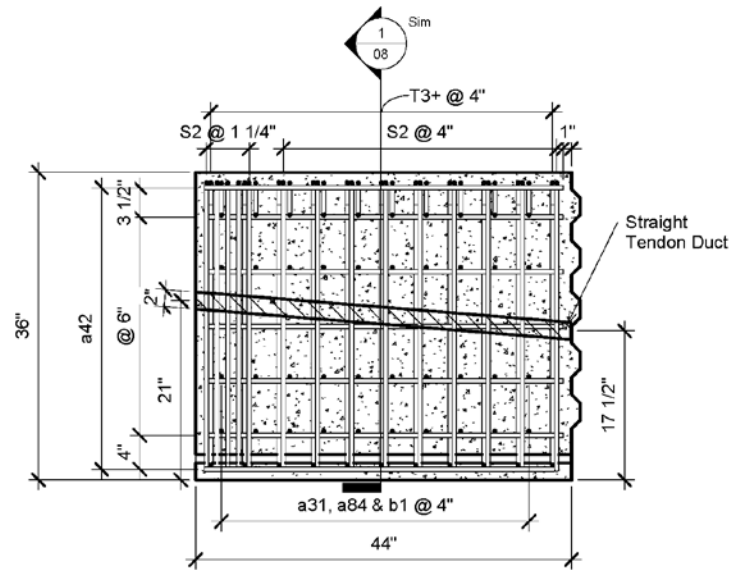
UNB2 Typical Longitudinal and Transverse Section
